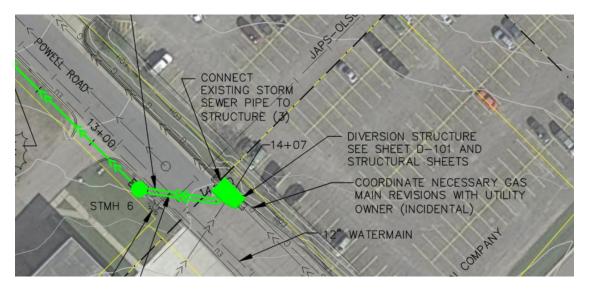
Exhibit A: Image from Powell Road Diversion Record Drawings. The Powell Road diversion is located adjacent to the Japs-Olson Company parking lot.
